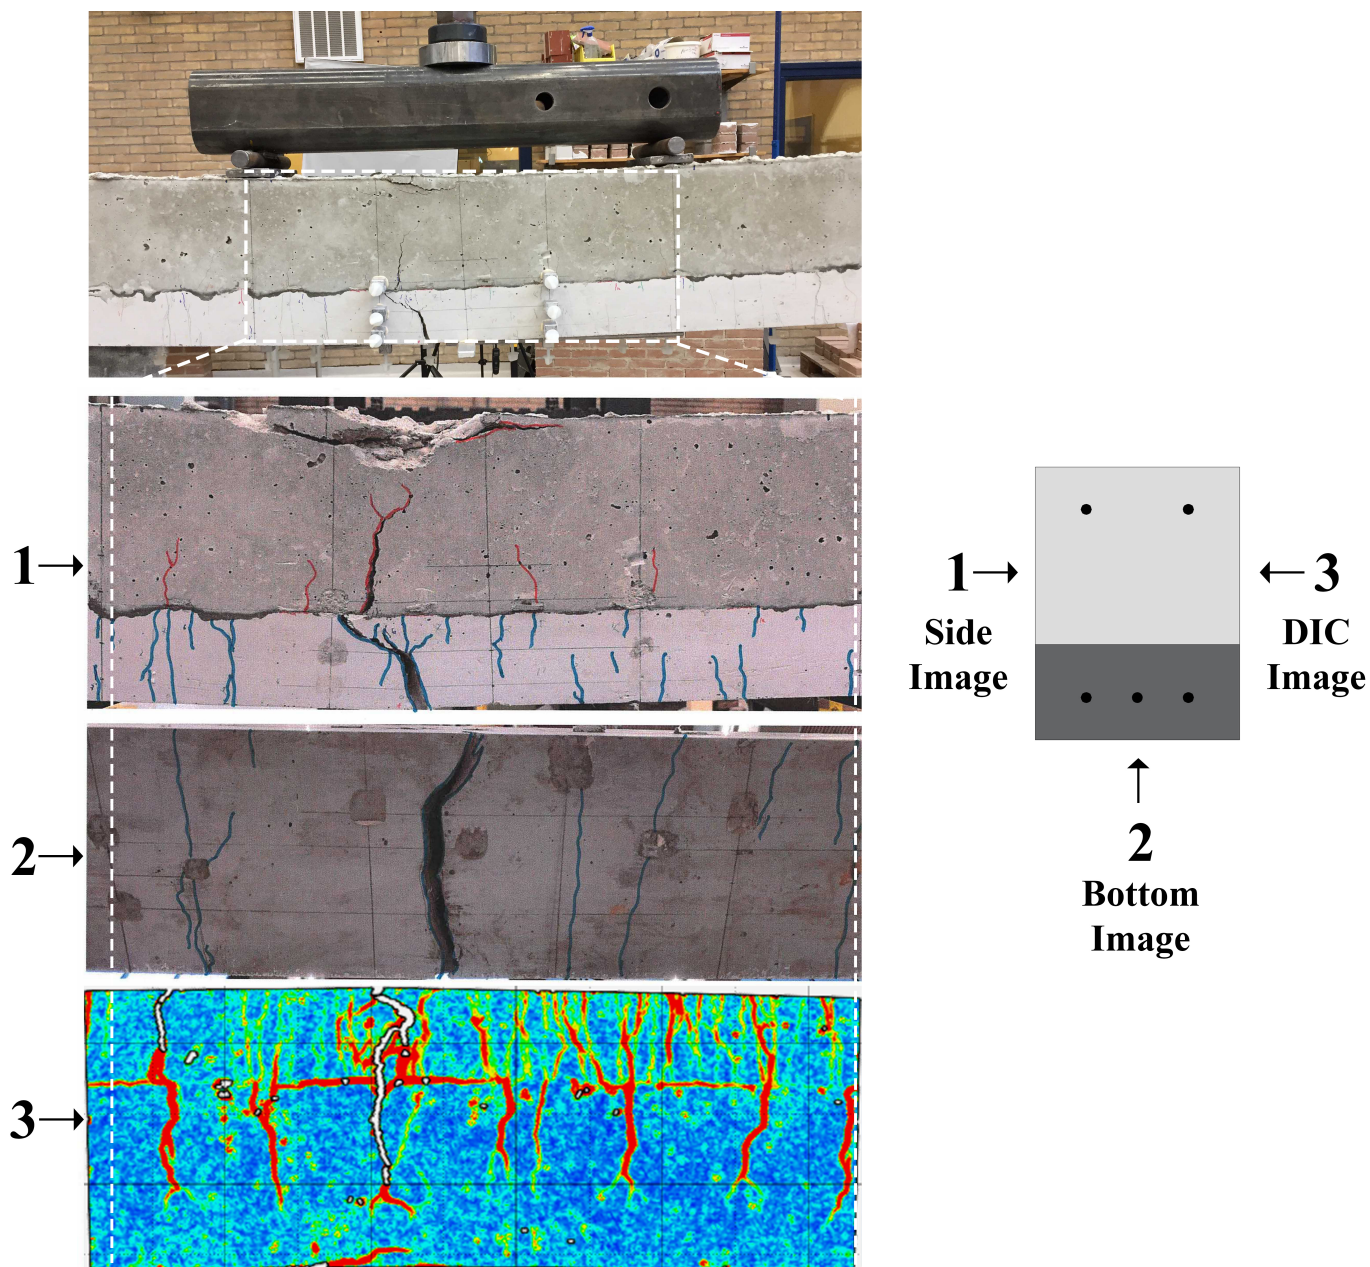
1-LVDT side, 2-Bottom side and 3-DIC side of PD-PVA beam specimen
